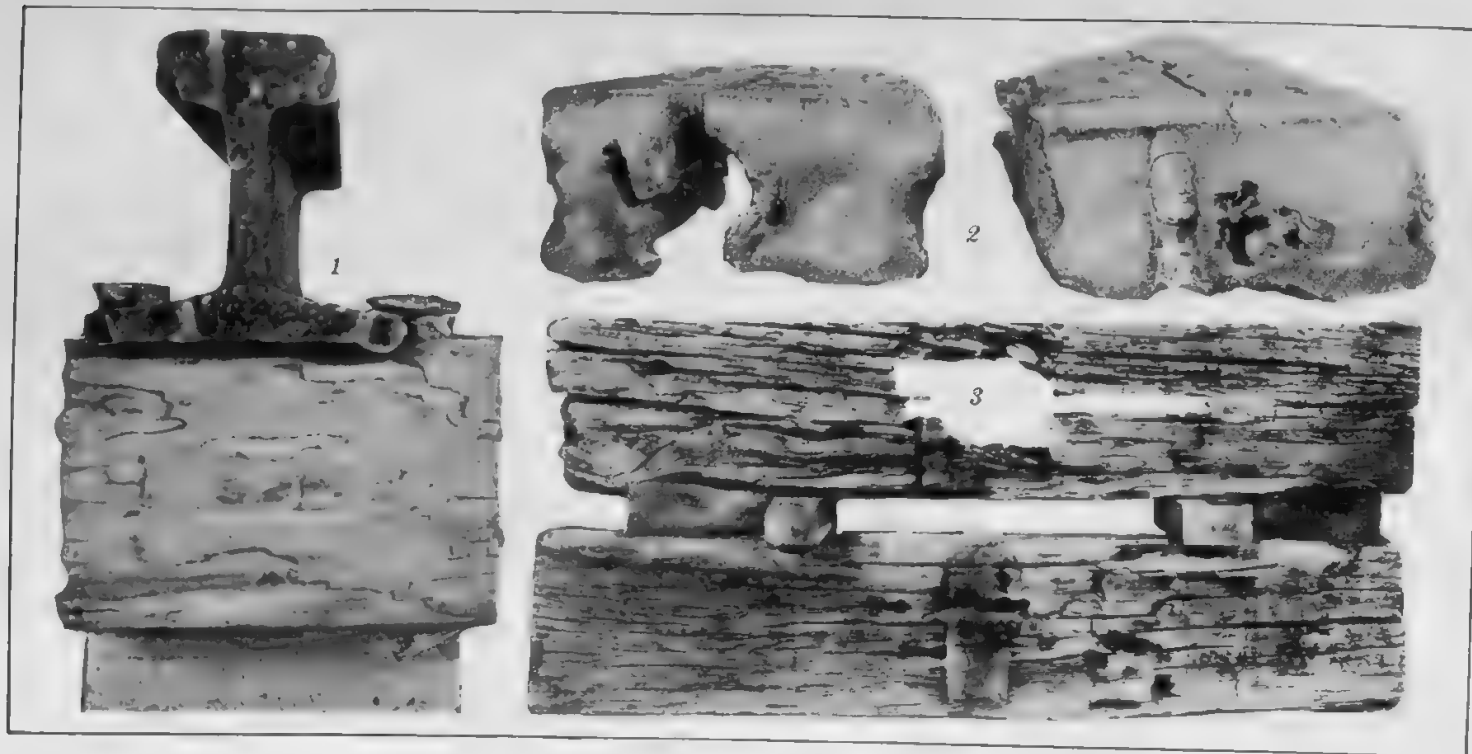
PLATE VIII. RAILWAY SLEEPERS DAMAGED BY TERMITES.
